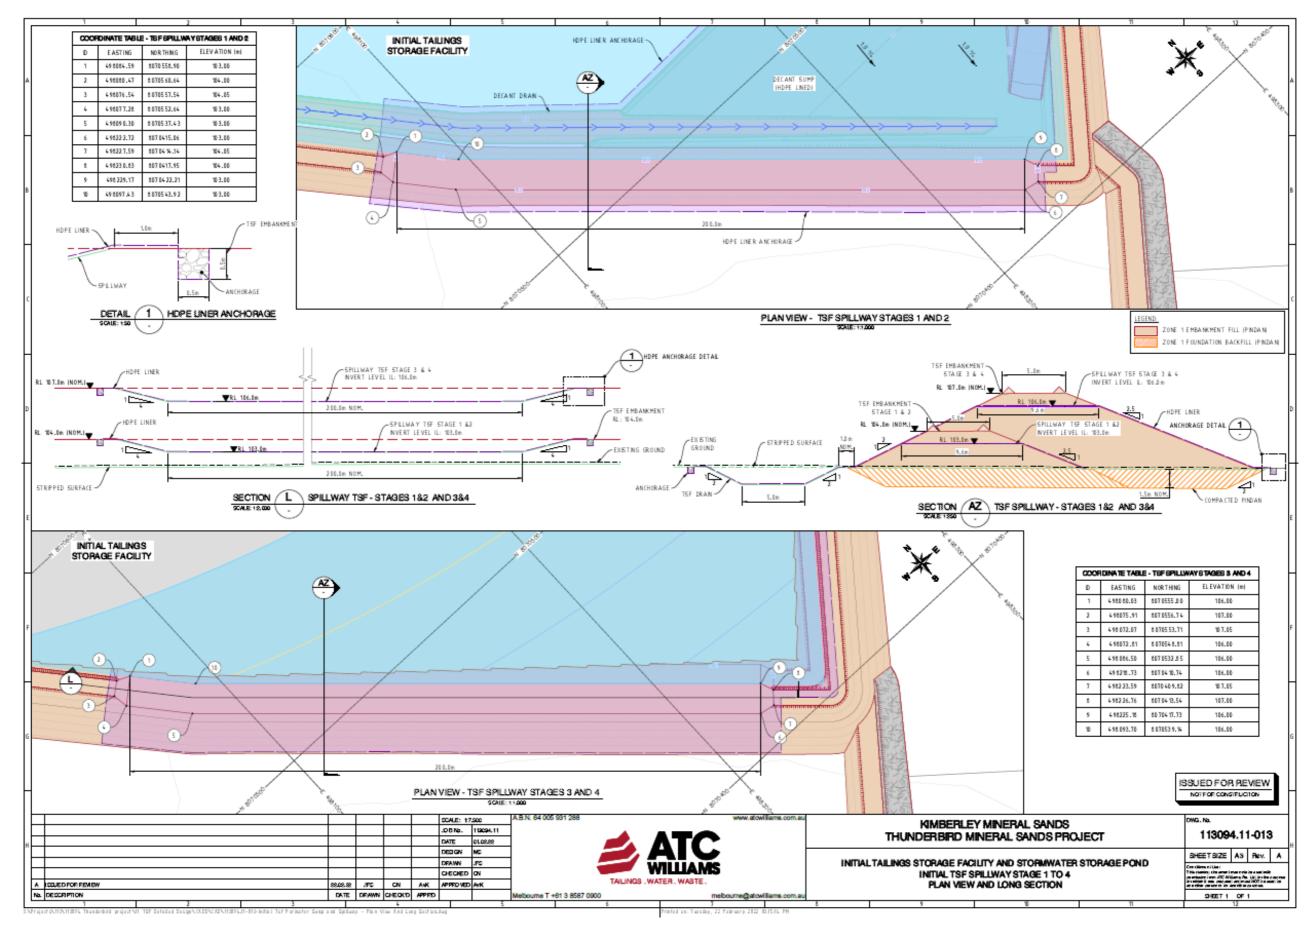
Drawing – Initial TSF and SPP, TSF spillway stage 1 to 4 plan view and long section
